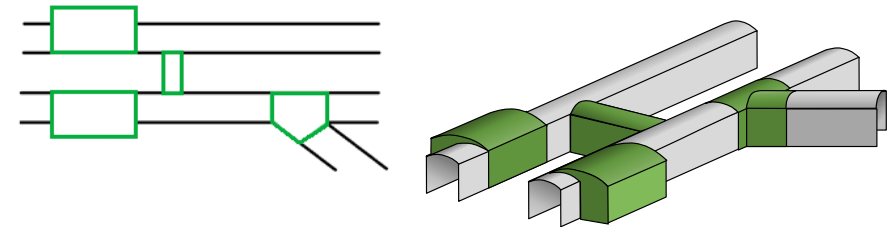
Scenarios of tunnel sections for formwork free shotcrete lining
